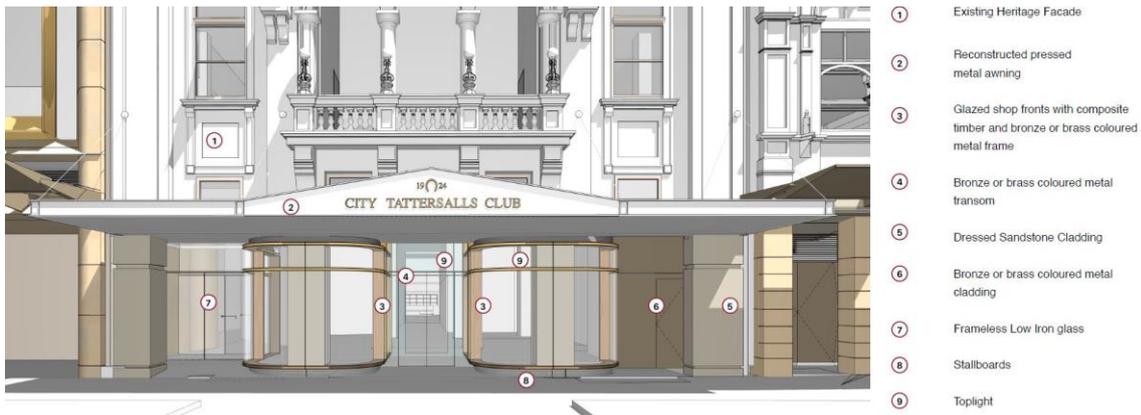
Proposed shopfront and street awning to the building at 198-200 Pitt St
